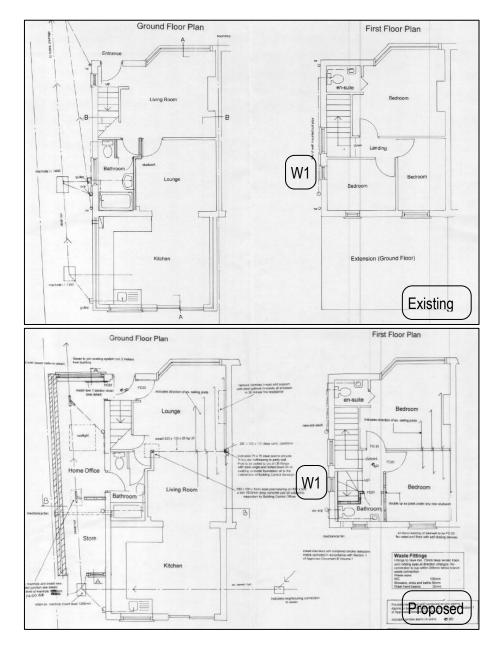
Window W1, Existing & Proposed (App Ref: 57831/APP/2014/2682)
